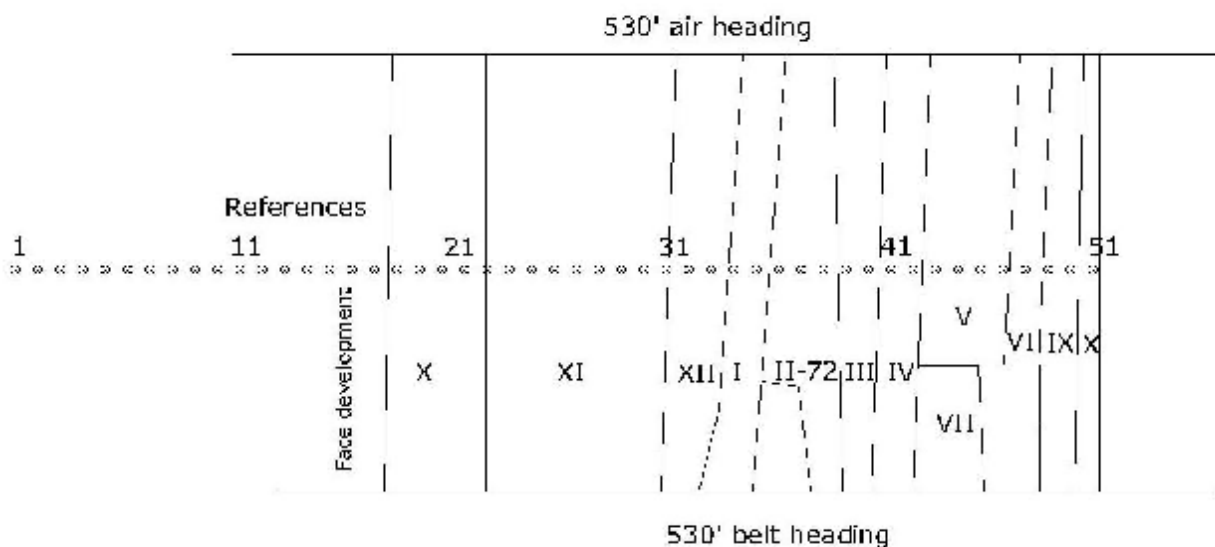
Plan of observation station 10 ("Yubileinaia" mine)
